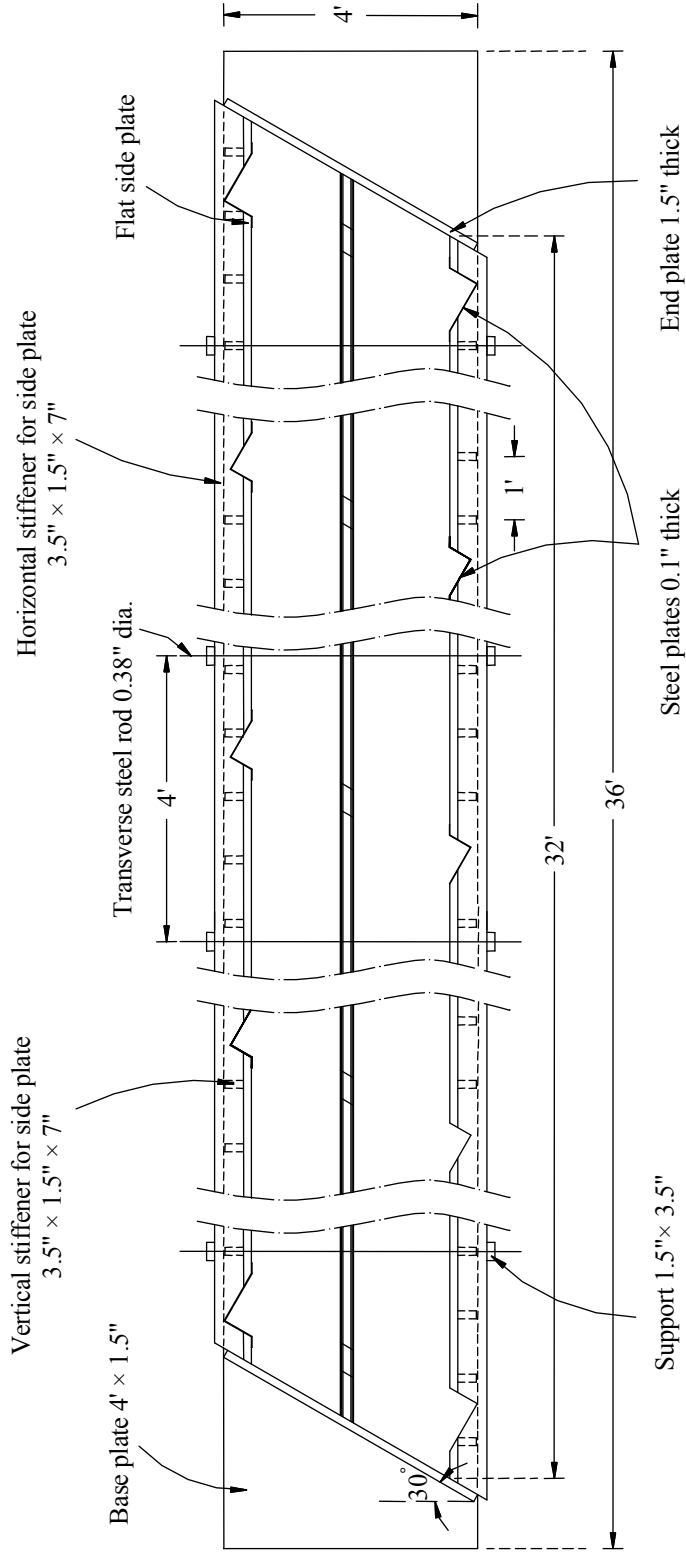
Plan view of the formwork for box-beams with projected side plates.
